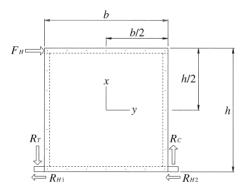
Structural model of timber framed wall assuming linear-elastic behaviour of fasteners
